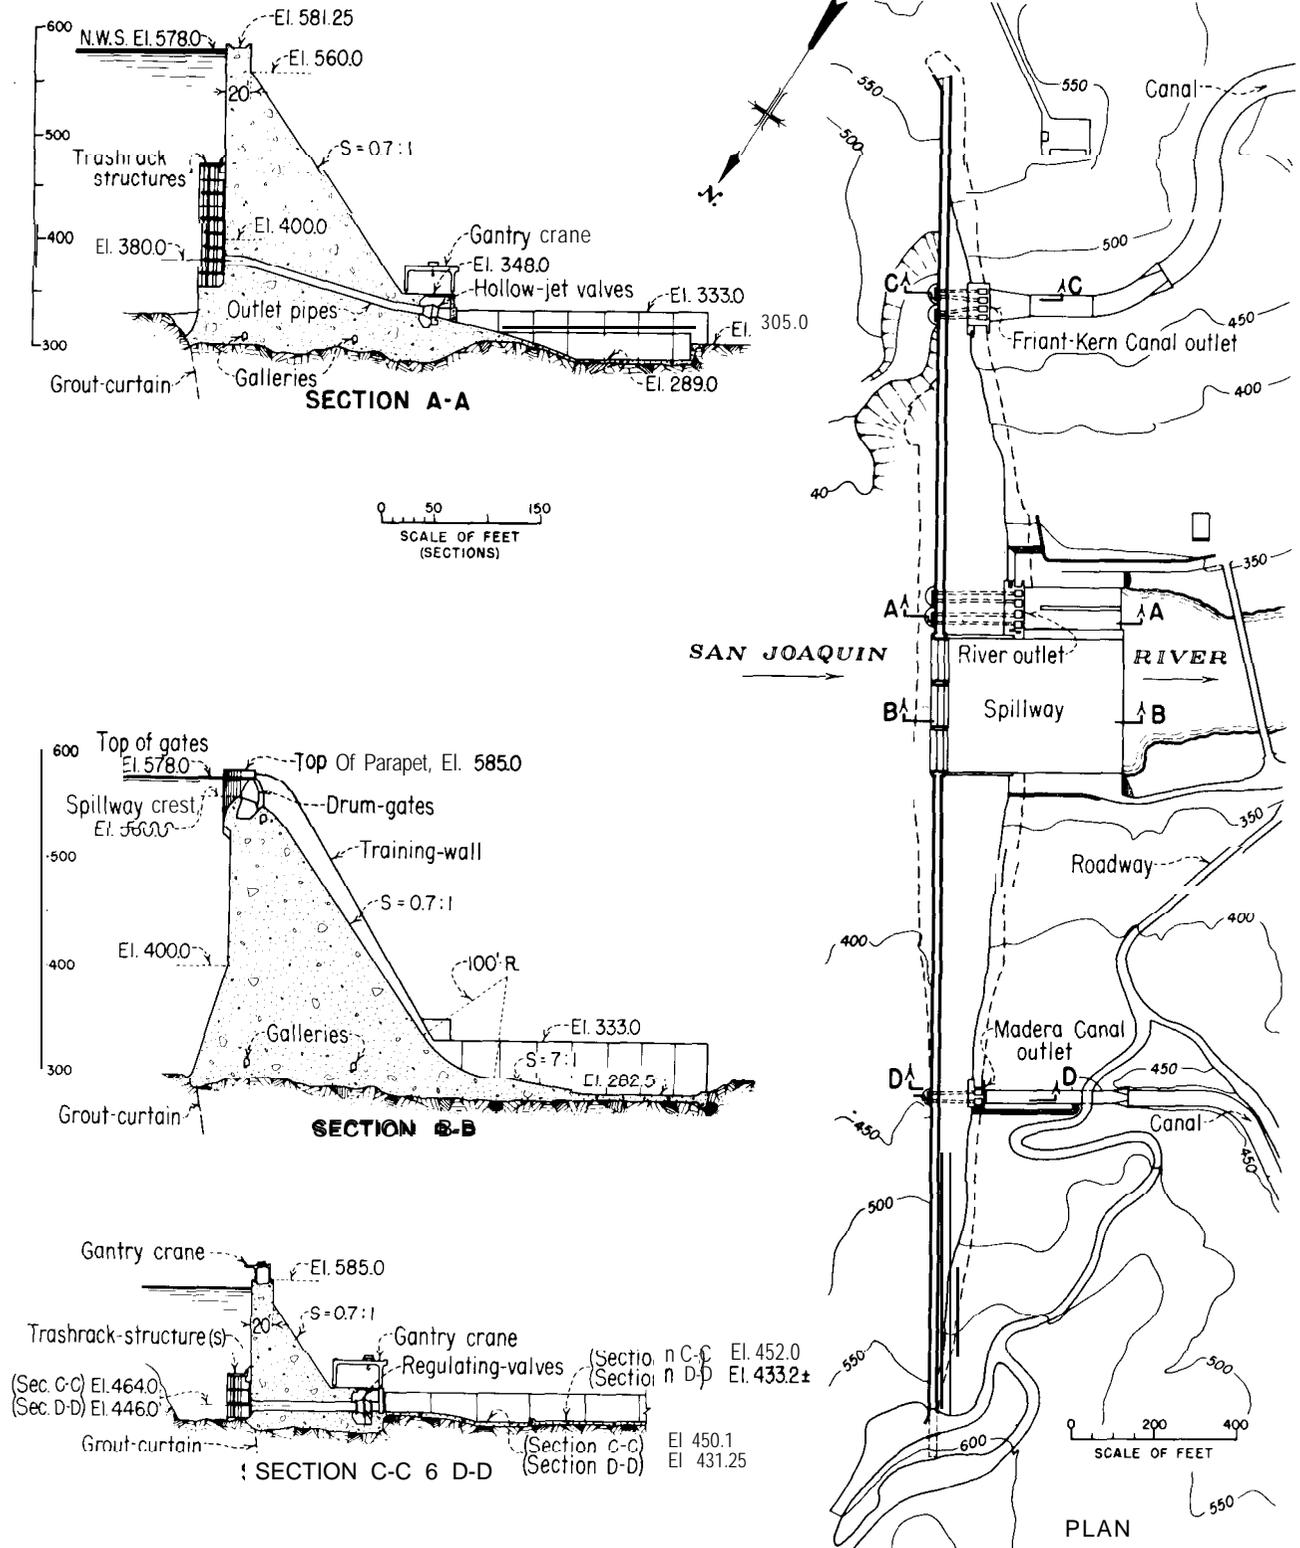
Friant Dam-plan and sections. -288-D-3156
